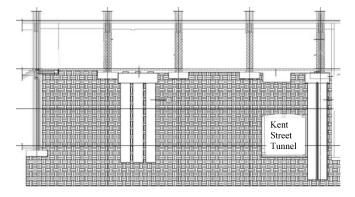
Removal of concrete around the steel columns, installation of underpinning piles and flatjacks.
